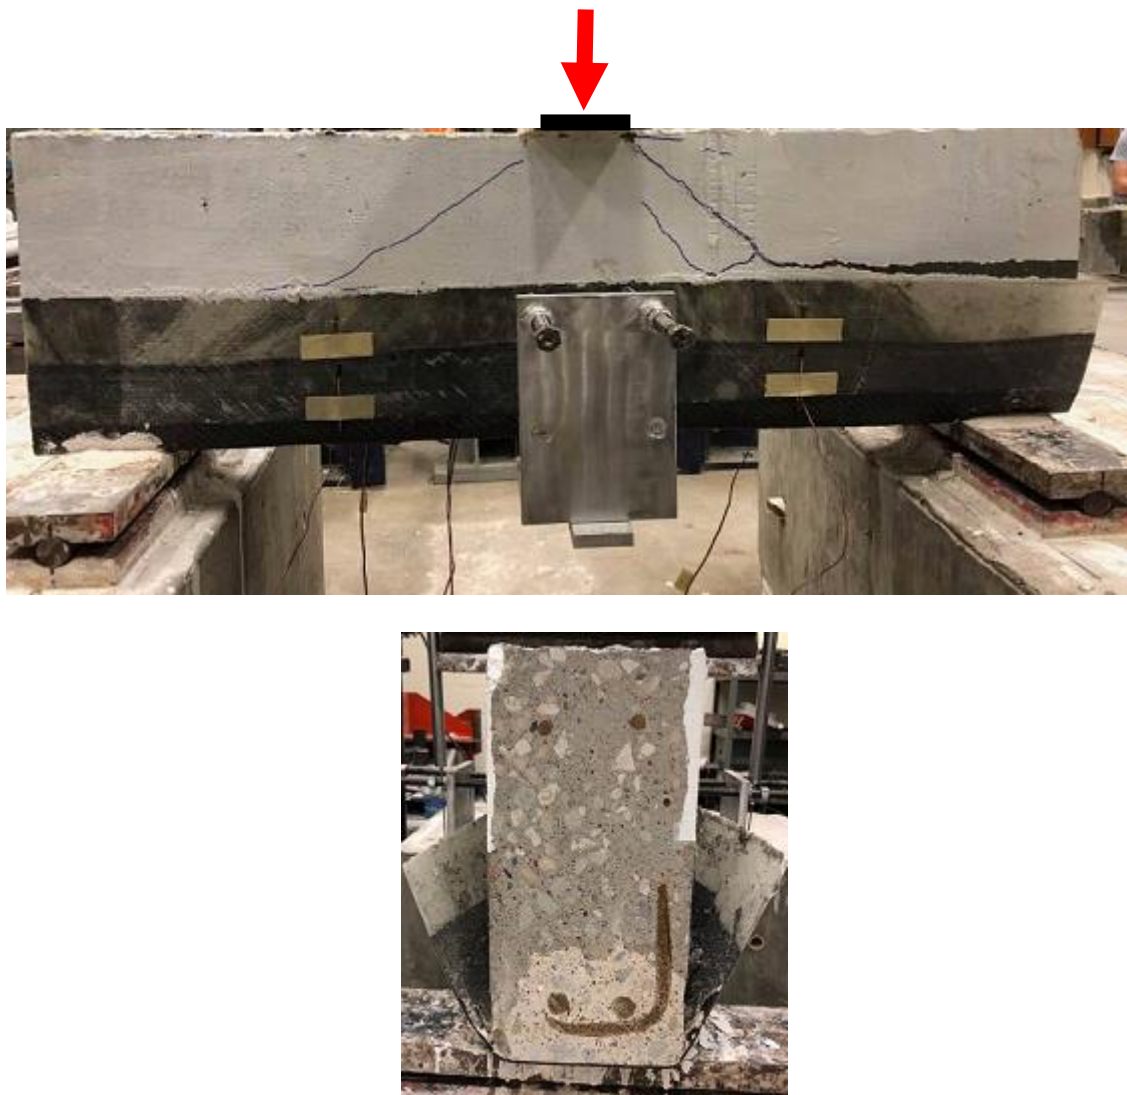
Cracks pattern of beam specimen (CSW-GSP)
